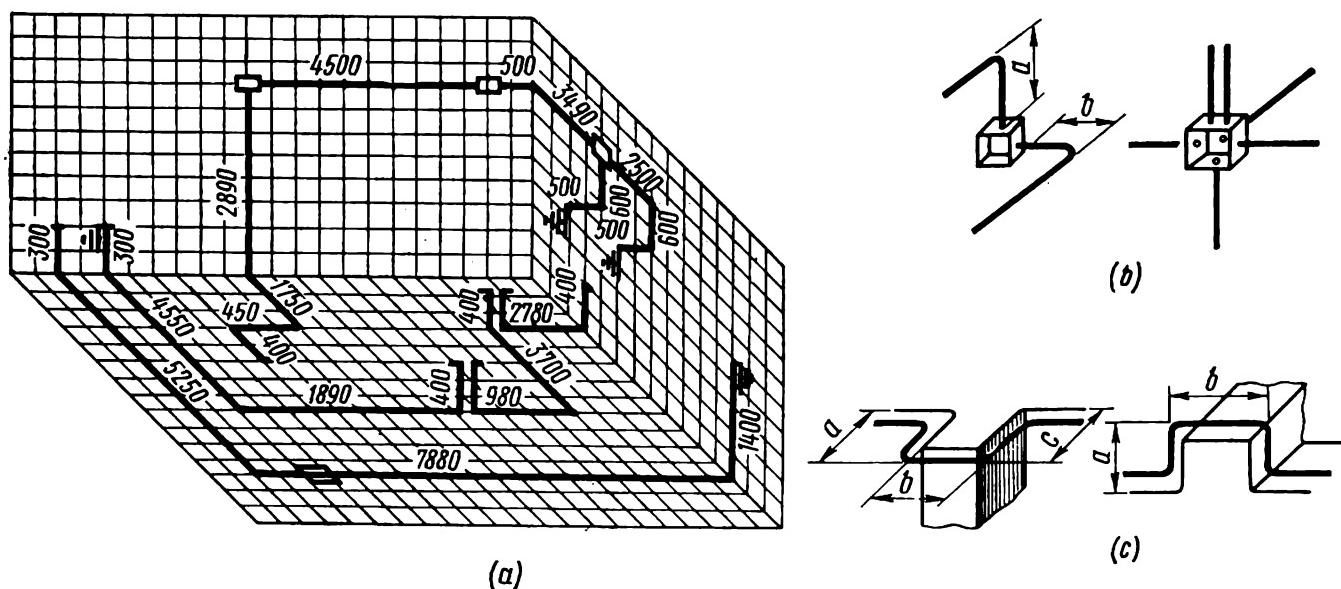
Drawing dimensional sketches for preassembling intricate conduits or pipelines
